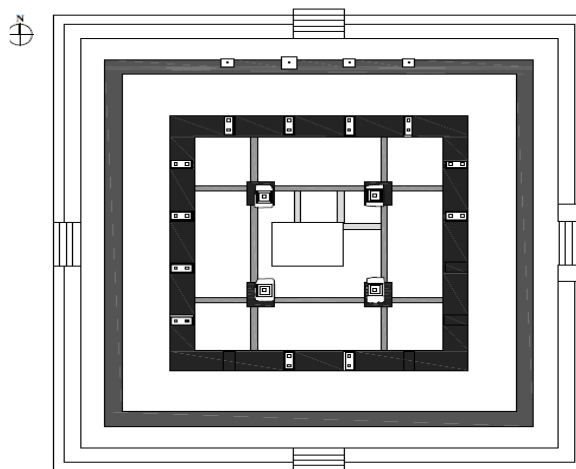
Foundation plan showing three groupings of columns on the ground floor (Tiwari, 2019)
